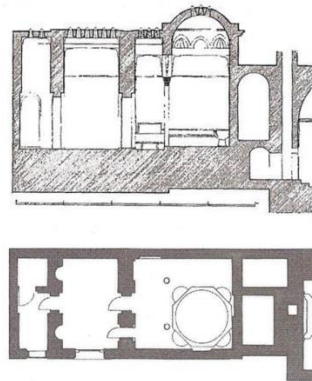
The bath plan and section of Zarif Paşa Yalısı, İstanbul
